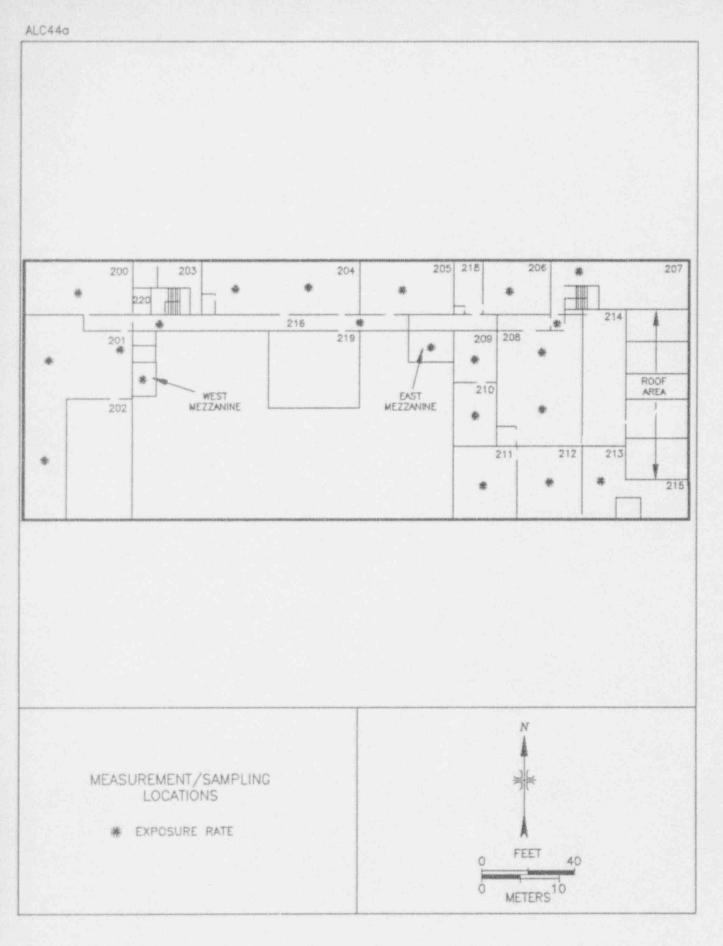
Building 65, Second Floor - Exposure Rate Measurement Locations
